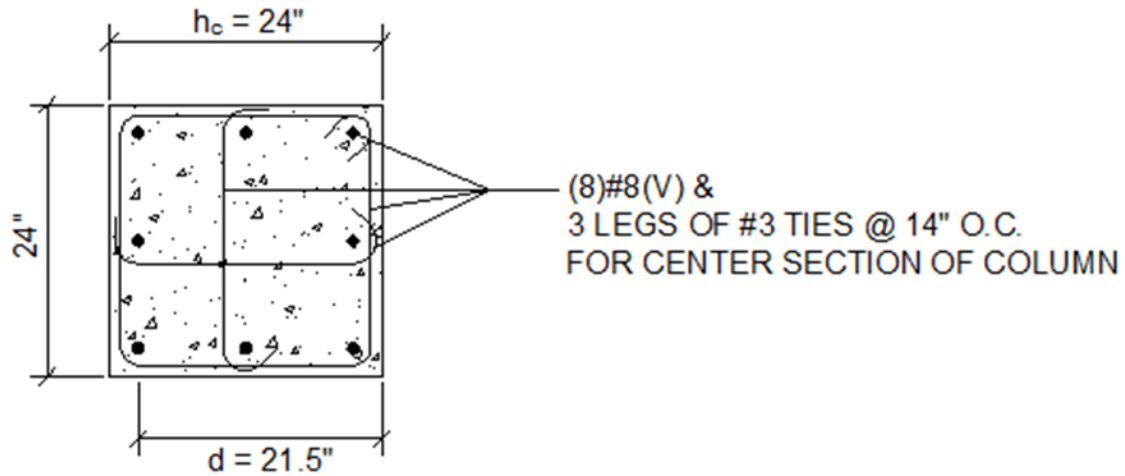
Exterior column, cross-section at center of column at all floor levels based on SDC C design.
